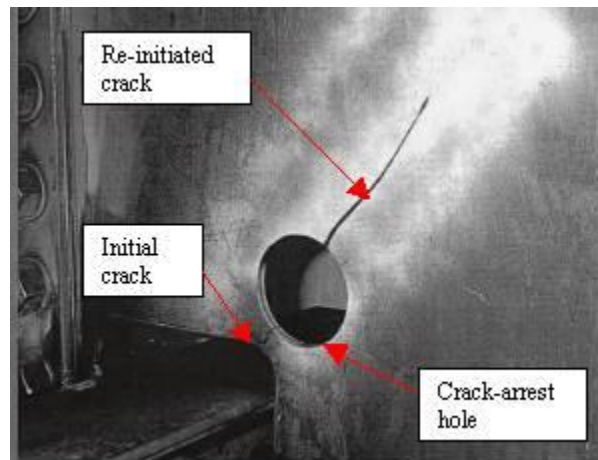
Fatigue Crack Re-Initiating through Stop Crack Hole (Dexter 2004)
